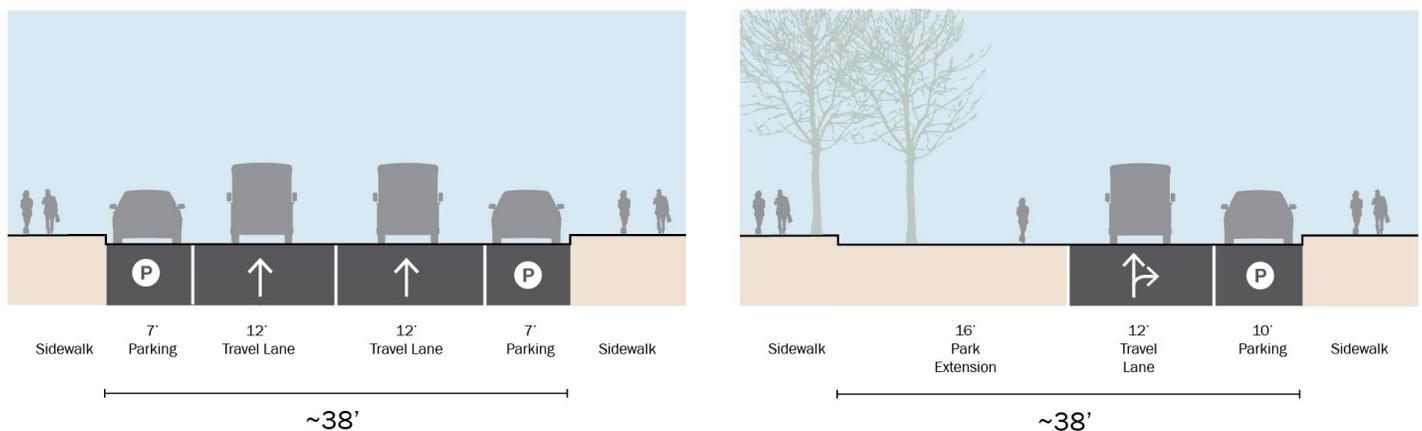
Existing and Recommended Cross Section of Sussex Avenue (looking west)
